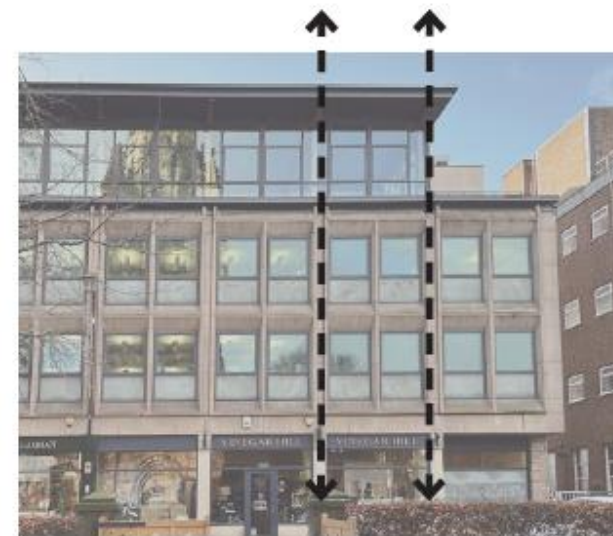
Expressing verticality - 22-24 St Mary's Street: A bay typology can introduce verticality to break up a horizontal elevation.
